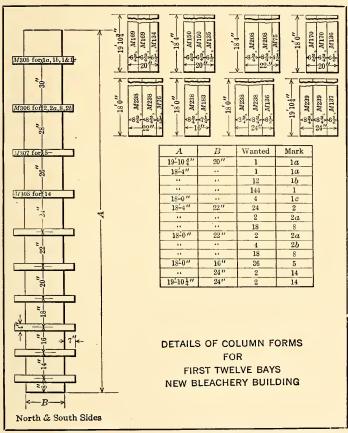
Standardized Plan Used in the Construction of a Larger Concrete Bleechery
